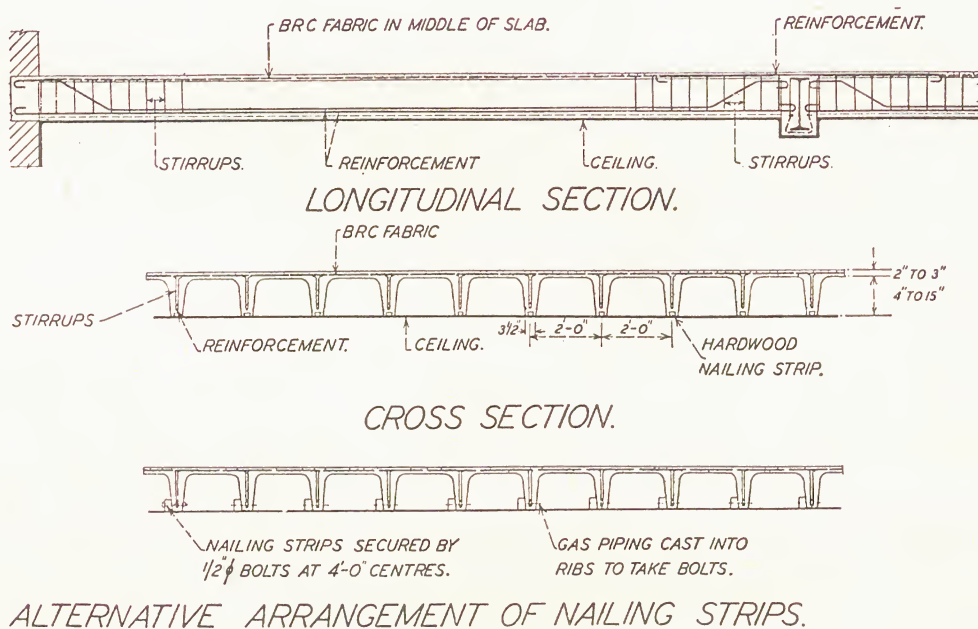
Steel tiles used as temporary forms in reinforced concrete floor of inverted trough section.
